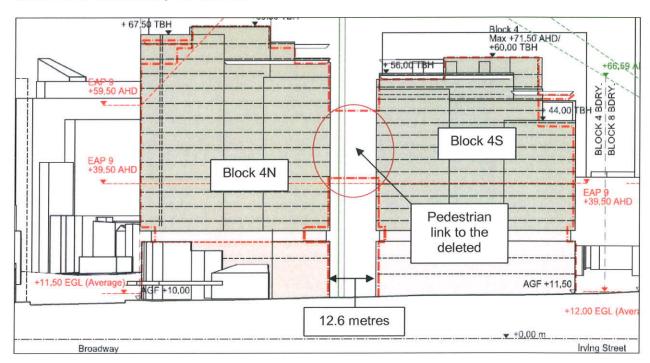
Proposed Abercrombie Street elevation looking east with the approved Concept Plan dotted red (Source: Proponent's application)
